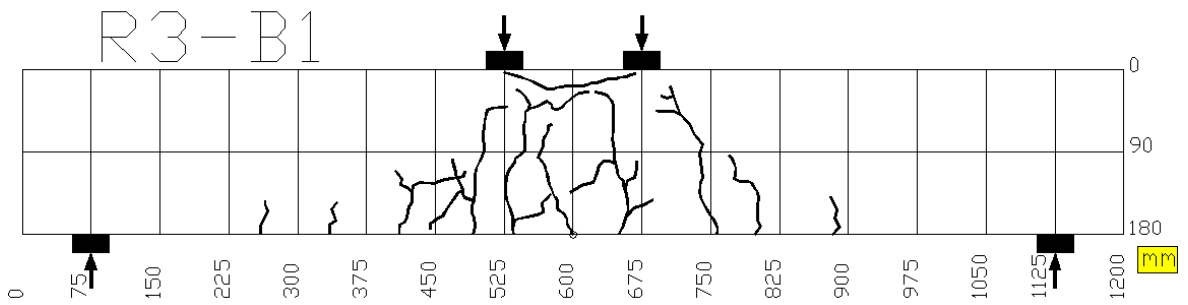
Crack Pattern for Beam (R3-B1) At Failure
